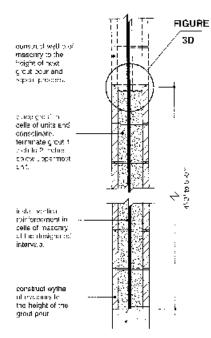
Grout pours up to 5 feet for single-wythe wall
